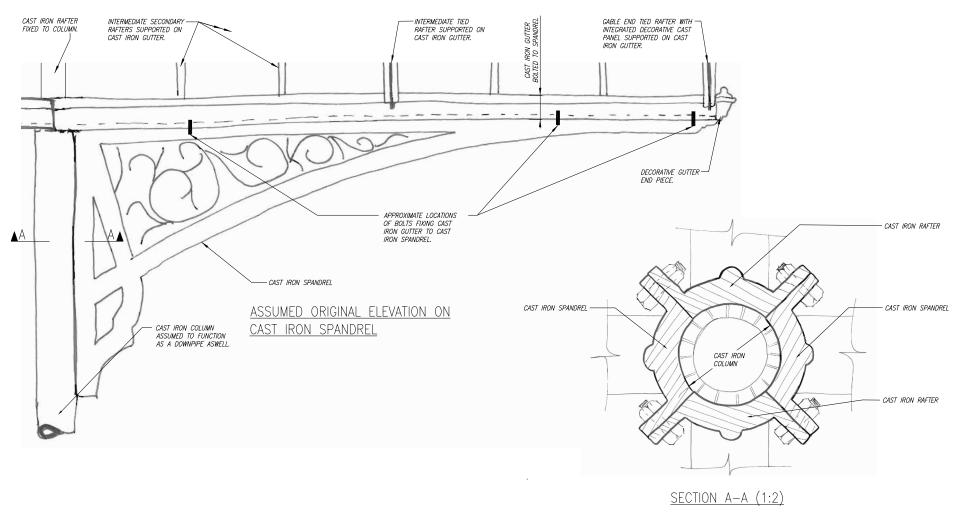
Sketch drawing from observation of existing 1879 canopies on platforms 2–4 showing bracket details
